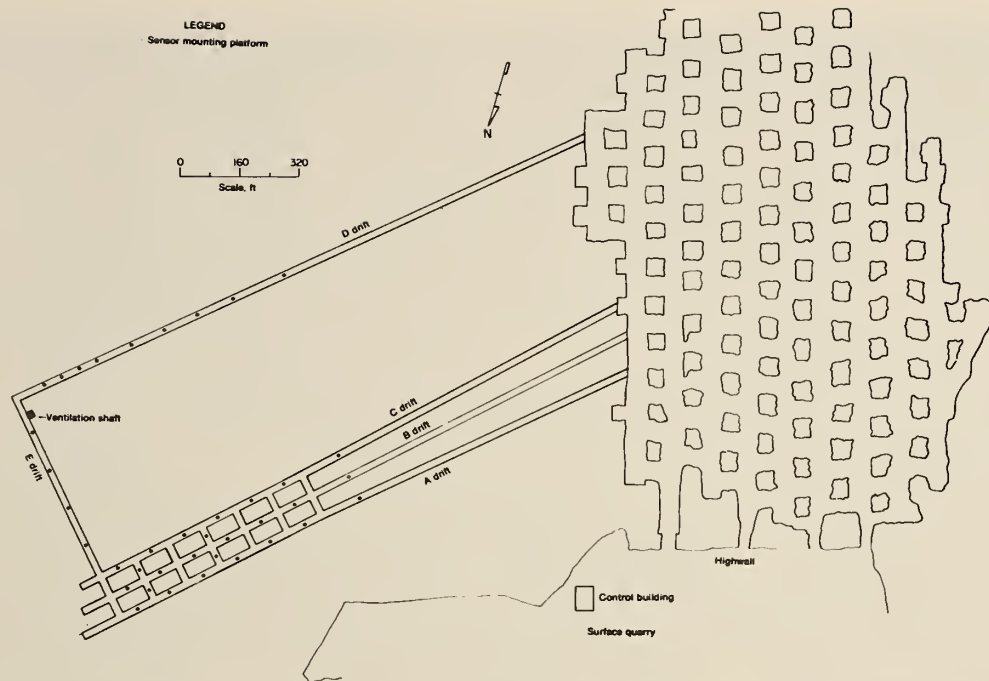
Instrument platform (sensor mounting platform) locations.
